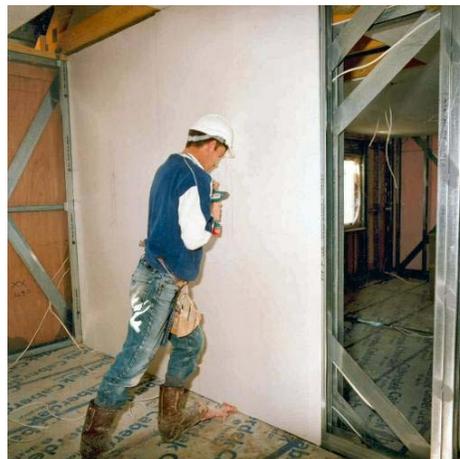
Screw fixing of plasterboard to light steel infill walls
